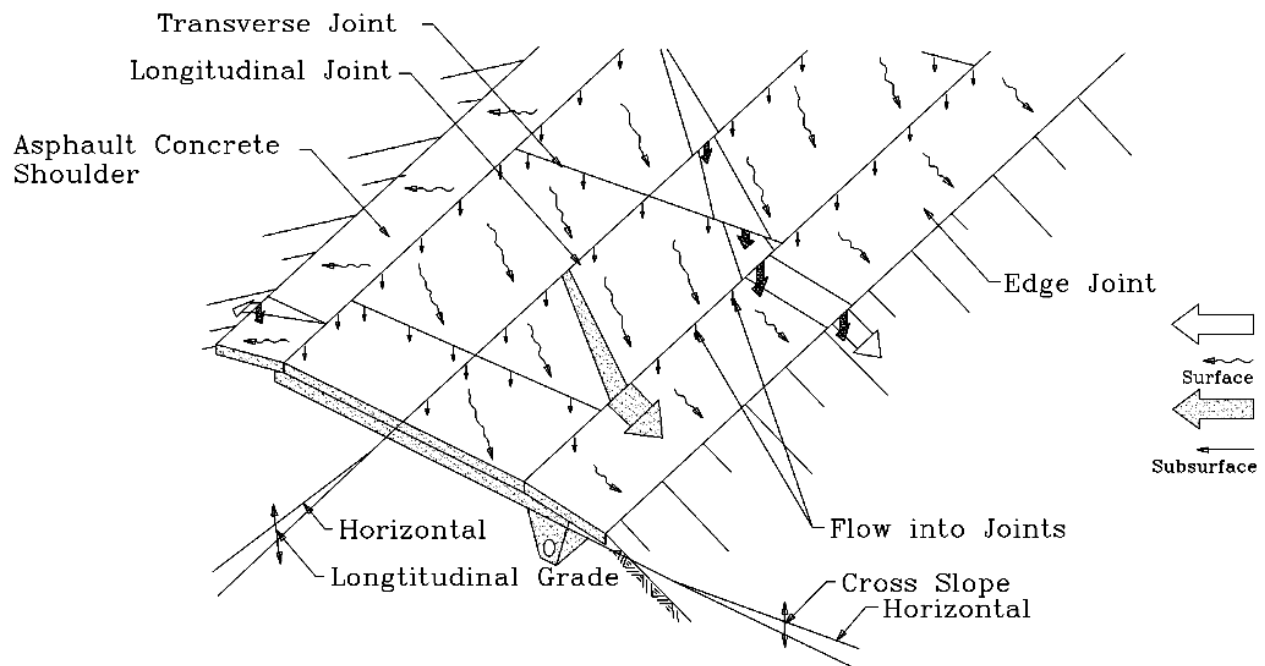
Paths of flow of surface and subsurface water in Portland cement concrete pavement structural section (redrawn from Cedergren, 1973a).
